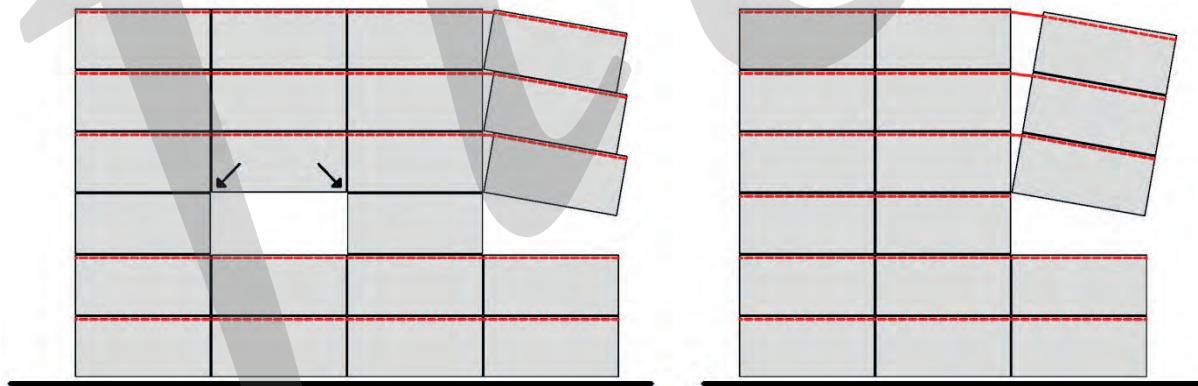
Mechanisms for alternative load path in wall frame structures. Left: an individual cantilever. Right: a composed multi-storey cantilever.
